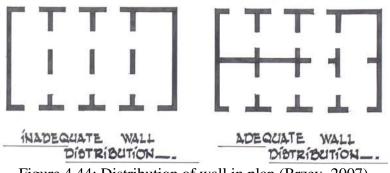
Distribution of wall in plan (Brzev, 2007)
